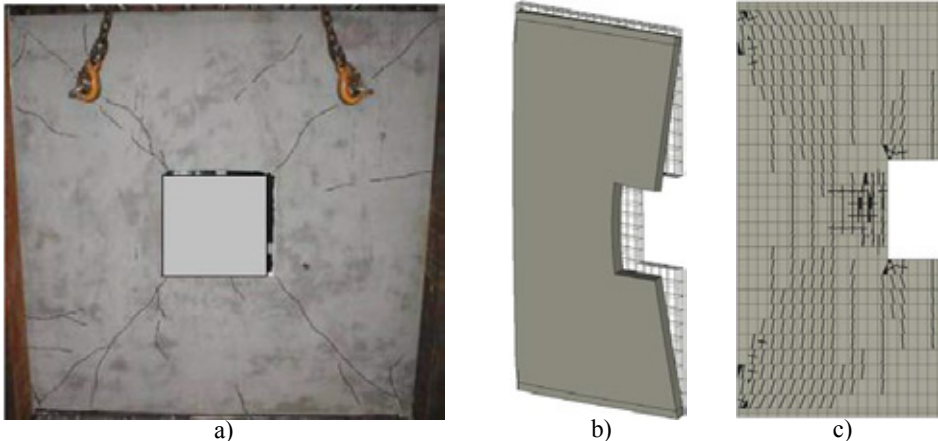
Crack pattern and failure mode for two-way walls: a) experimental [12]; b) deformed shape - FEM; c) crack pattern - FEM
